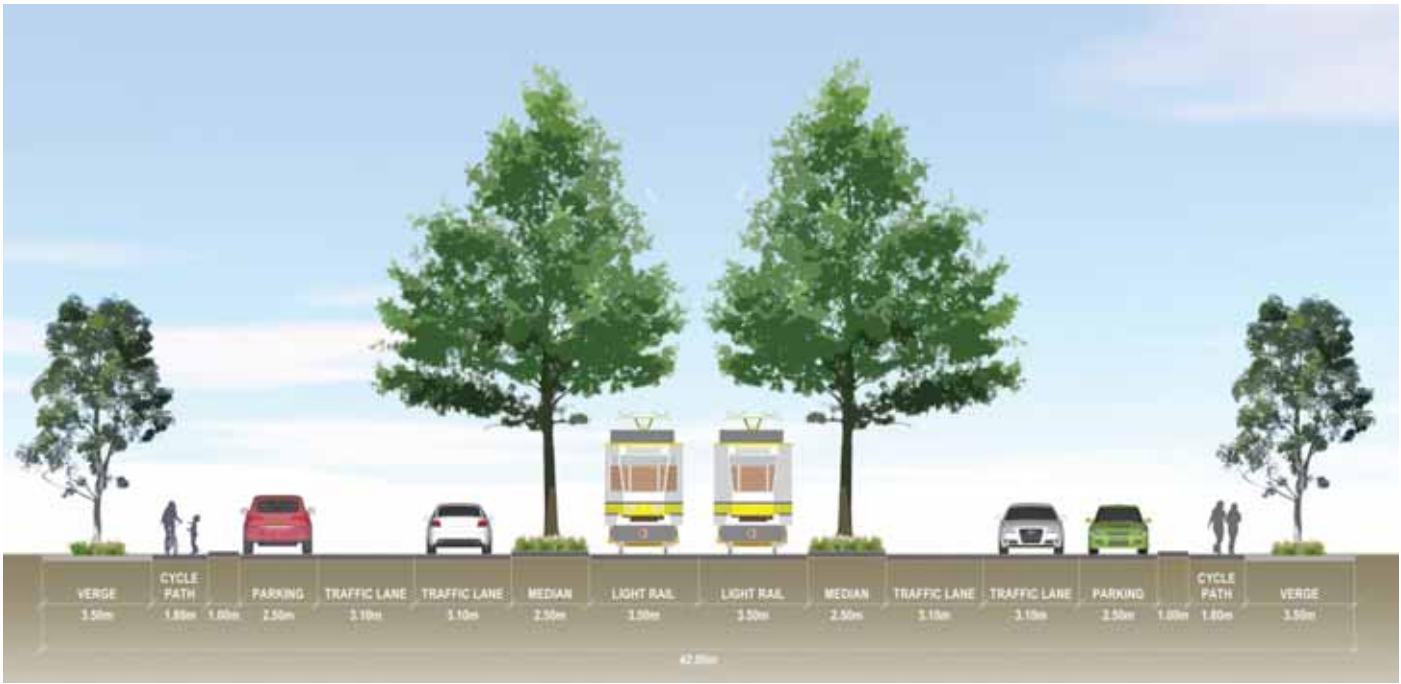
Ellen Stirling Boulevard Conceptual Cross Section (Howe Street to Scarborough Beach Road)
